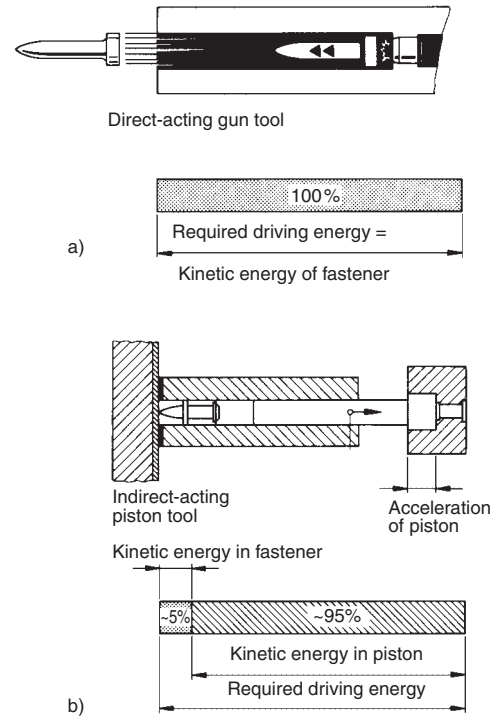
Direct installation fasteners (Eligehausen, Mällée, Rehm (1997))
